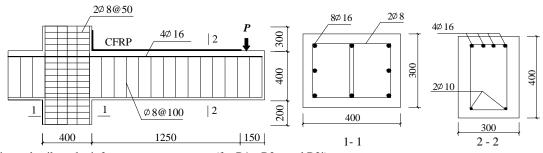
Specimen details and reinforcement arrangement (for B1e, B2e, and B2i).
